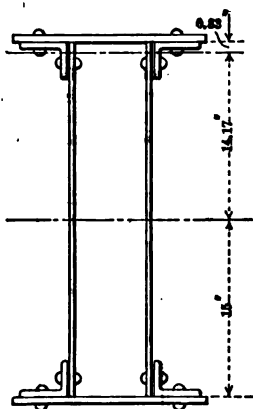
Moment of Inertia of Cross-section of Plate-and-angle Box Girder
